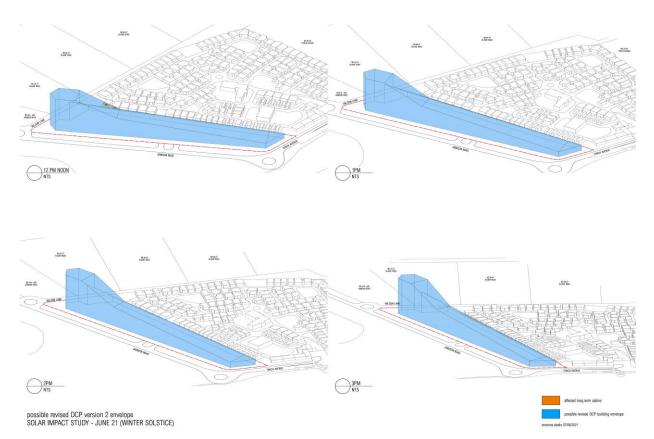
Solar study 4 - revised building envelope (Environa Studio, June 2021)
